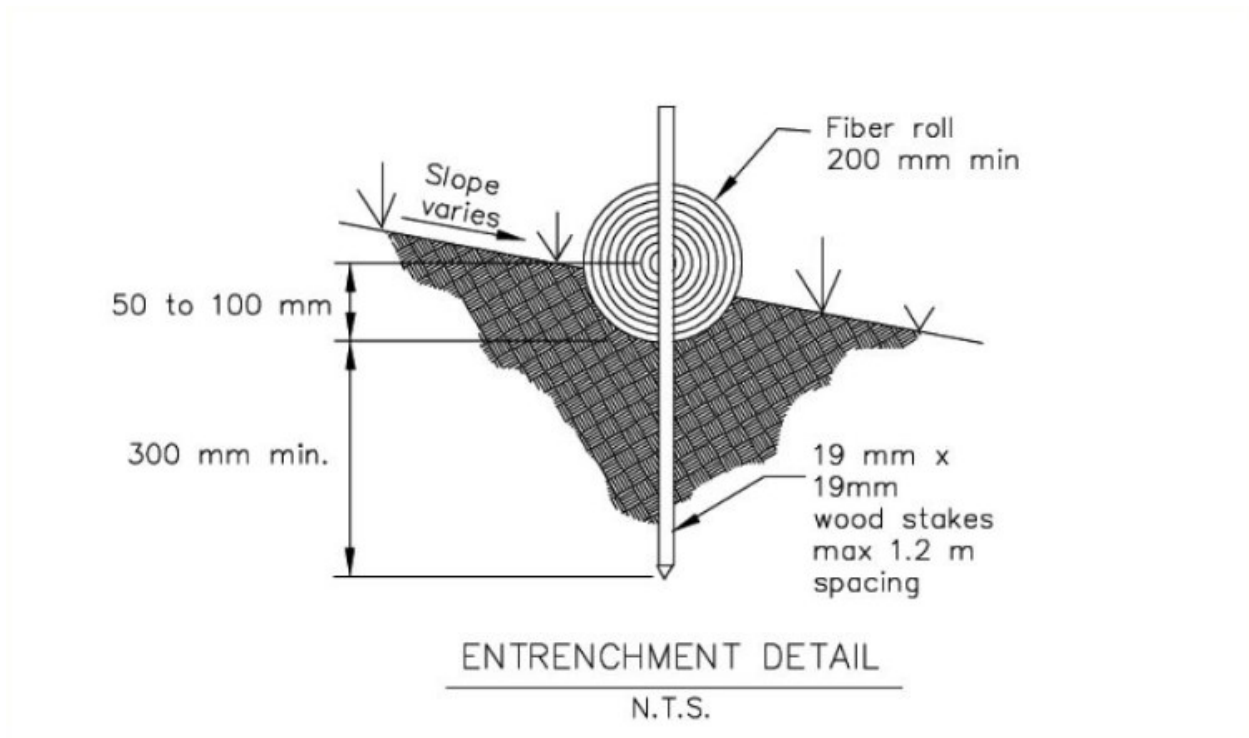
Entrenchment Detail for Typical Fiber Roll Installation as a method of erosion control.
